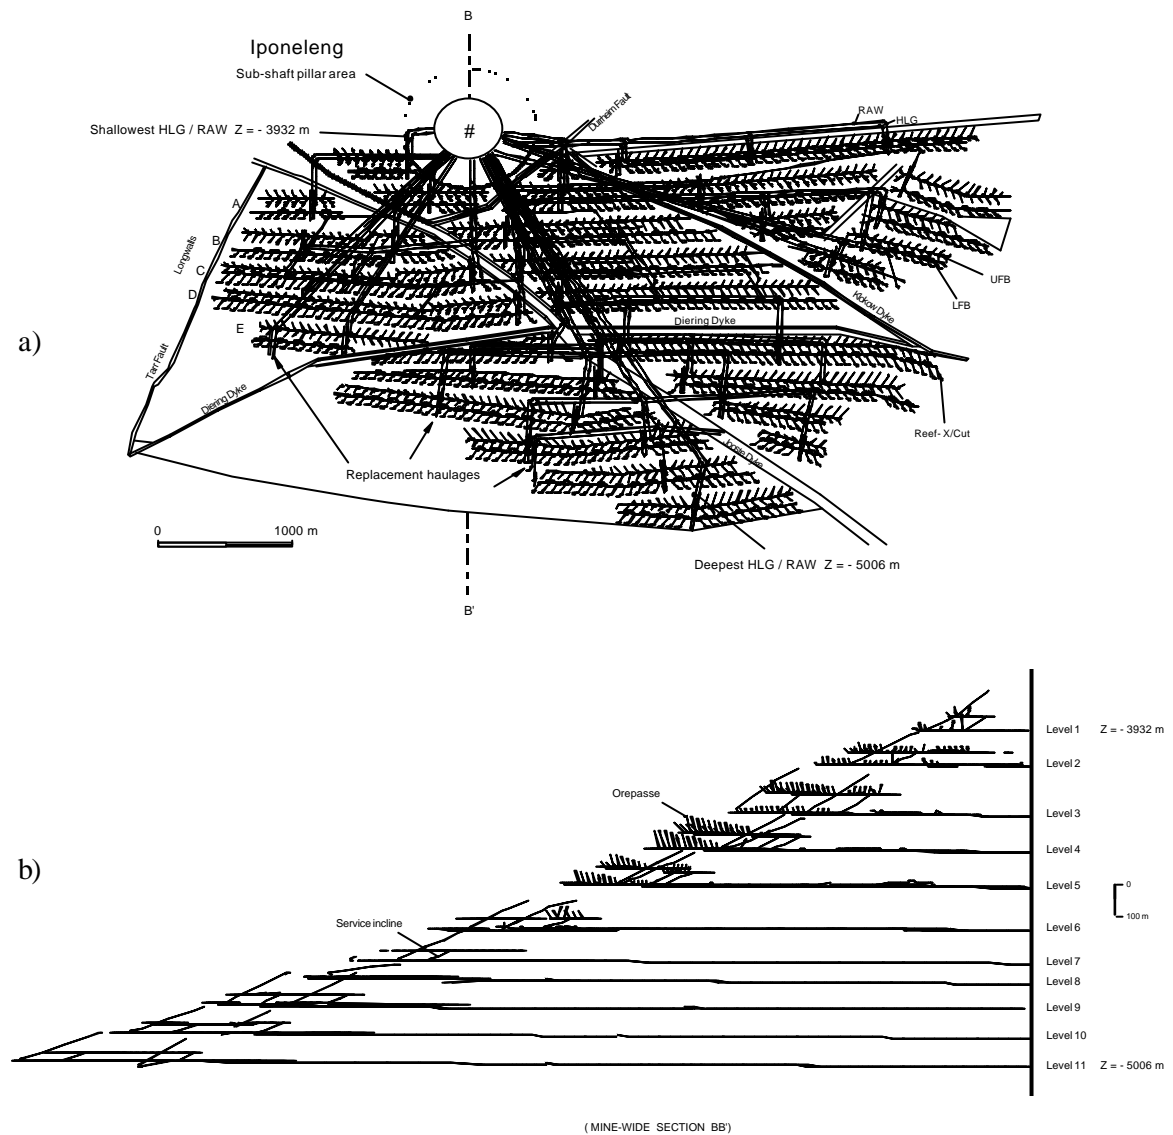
Macro concept of a longwall layout with strike stabilising pillars. Three longwall units are depicted. Replacement haulages are shown, these being developed roughly every 750 m.
